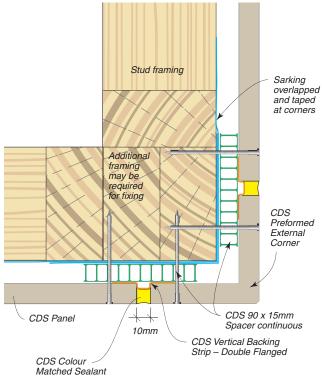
External Corner Detail – With CDS Coloured Corner Trim – Plan
